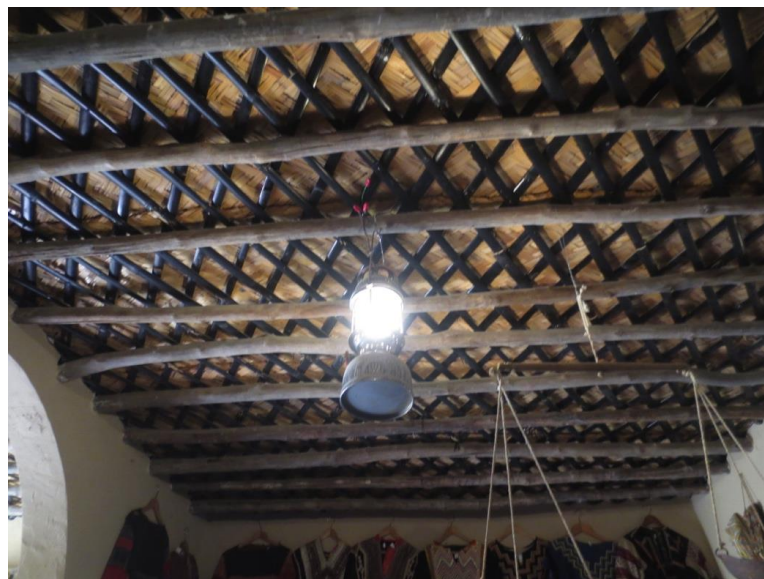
Ceiling construction material and wood beams (*danchal*).
